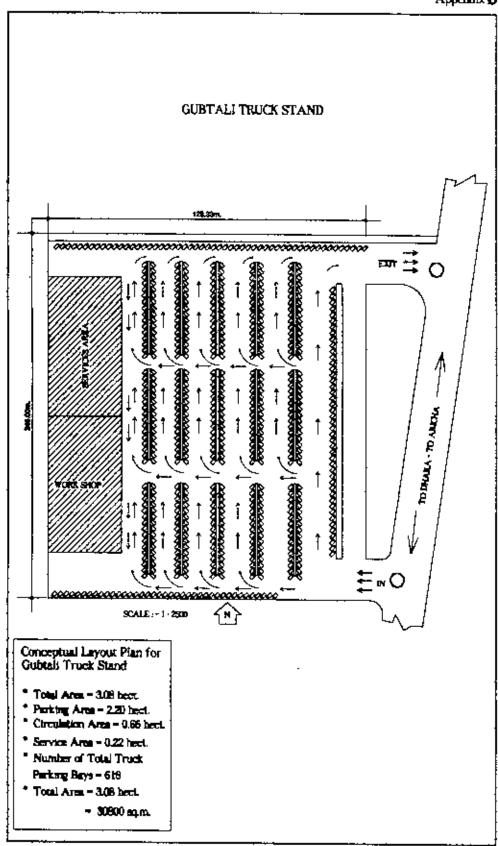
Conceptual Layout Plan for Gubtali Truck Terminal
